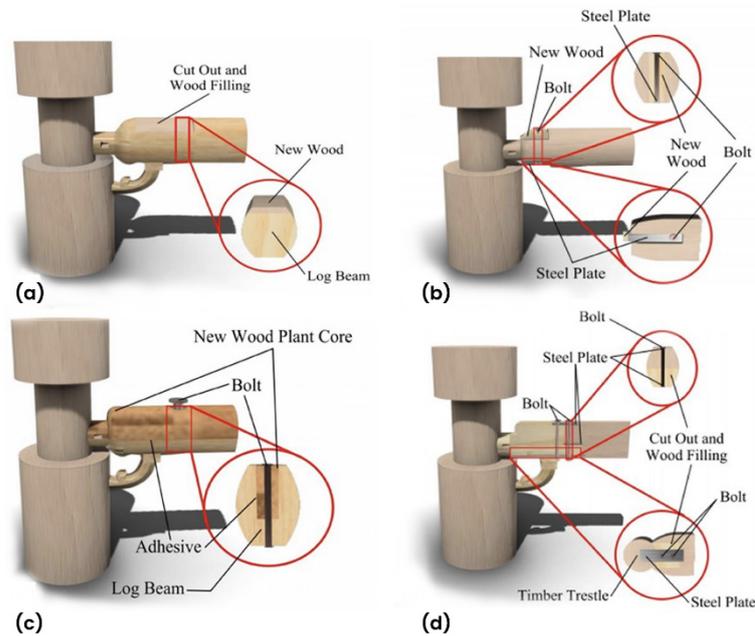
Schematic diagram of crack repair of beam and tie-beam.
